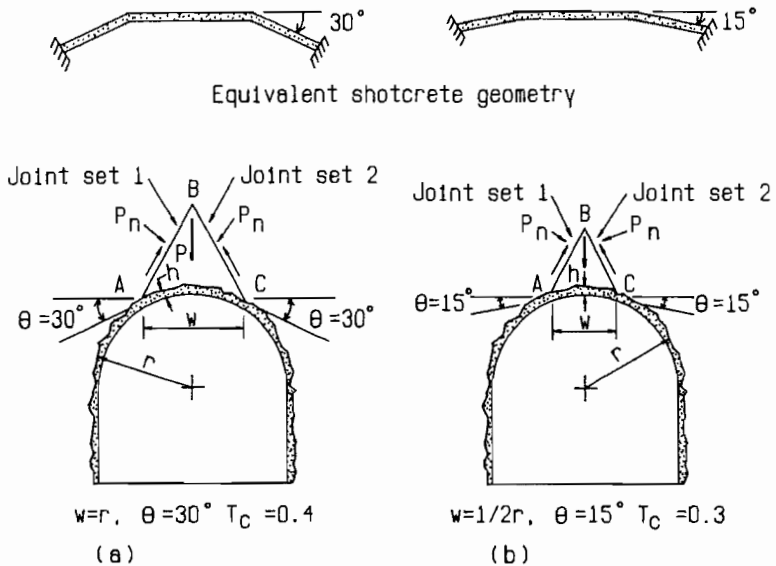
Shotcrete Supporting Rock Wedges.
